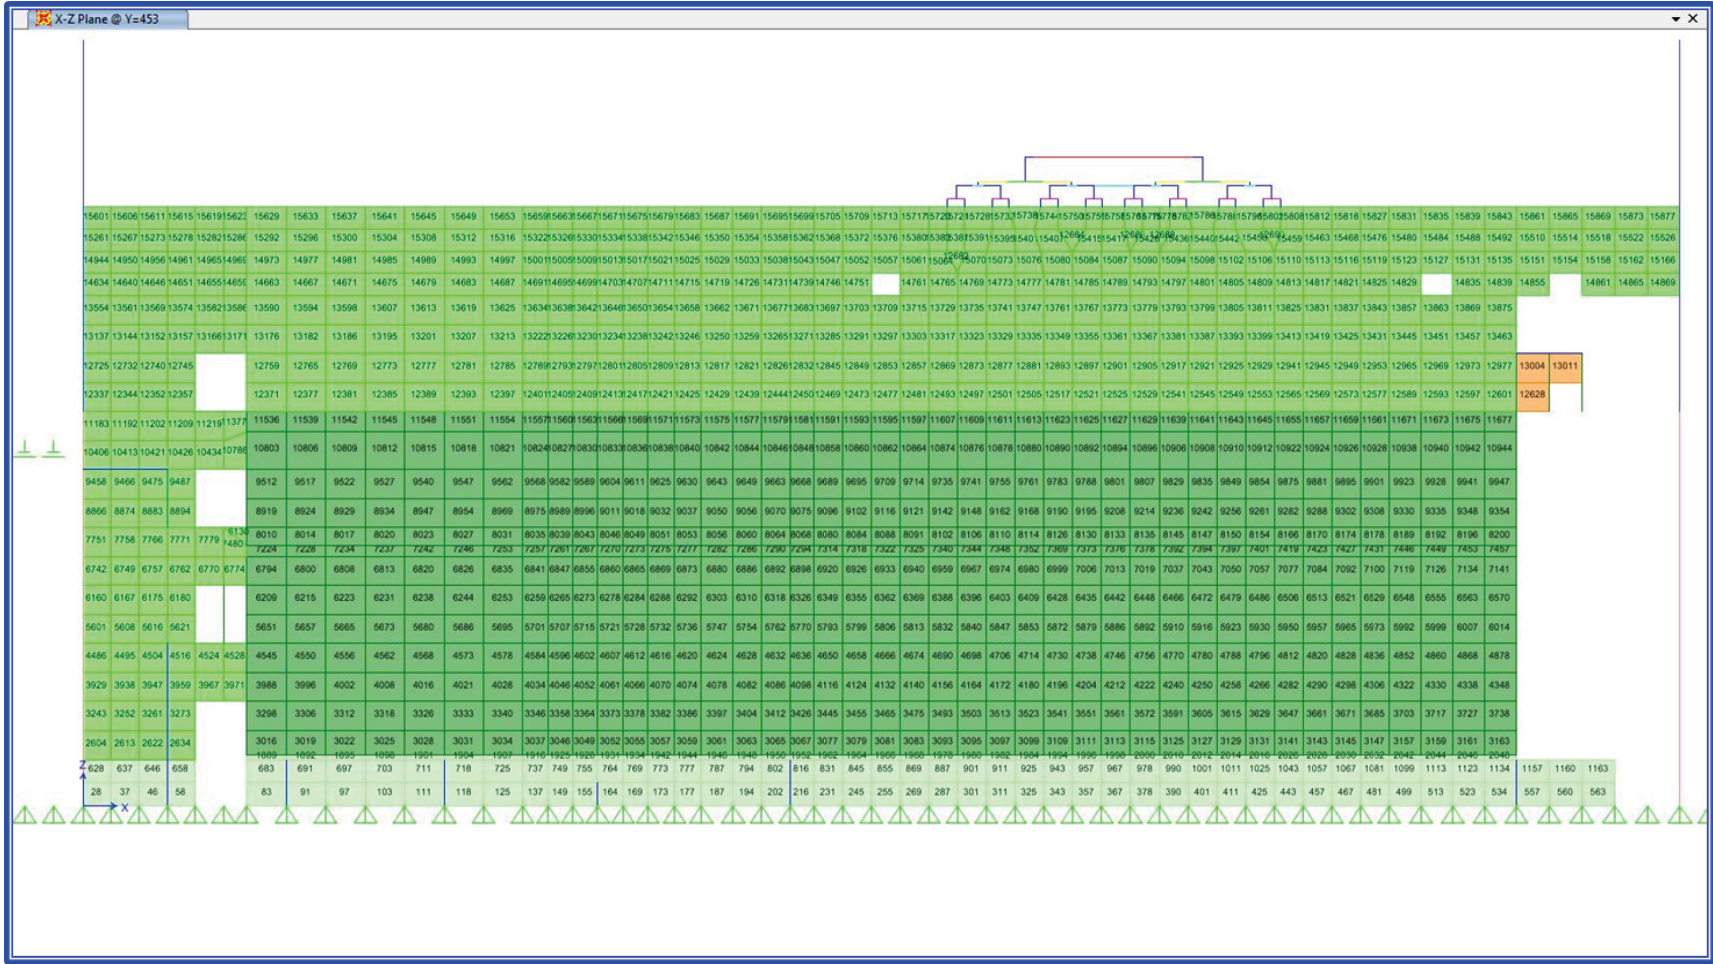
B-46: RXB Reinforcement Elevation at RXB Wall at Grid Line B
